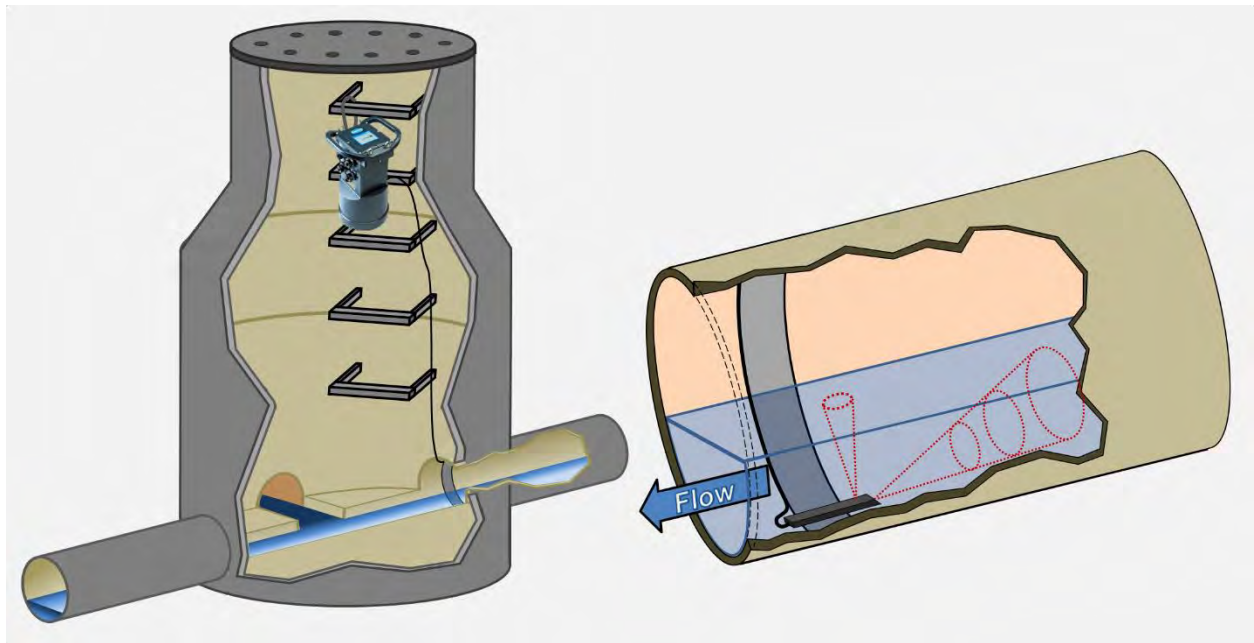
Typical Installation for Hach 902 Flow Meter with Submerged Sensor
